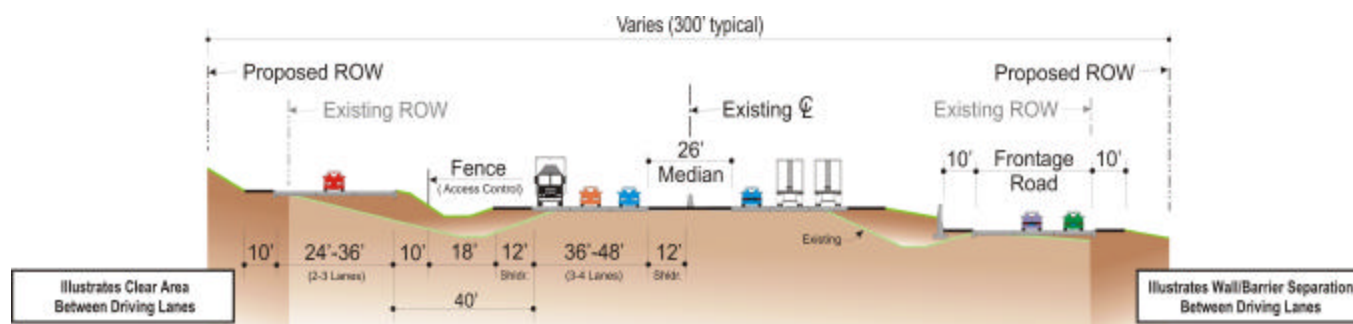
Urban I-70 Widening With Frontage Roads Typical Section
